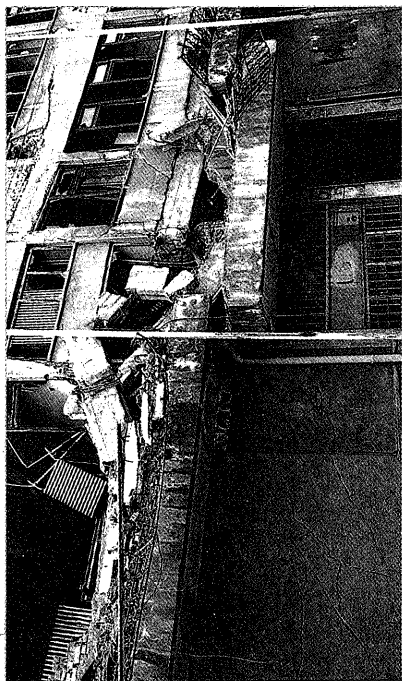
Mid-Storey Collapse of RC Building in Karaağaç District, other Floors Severely Damaged
